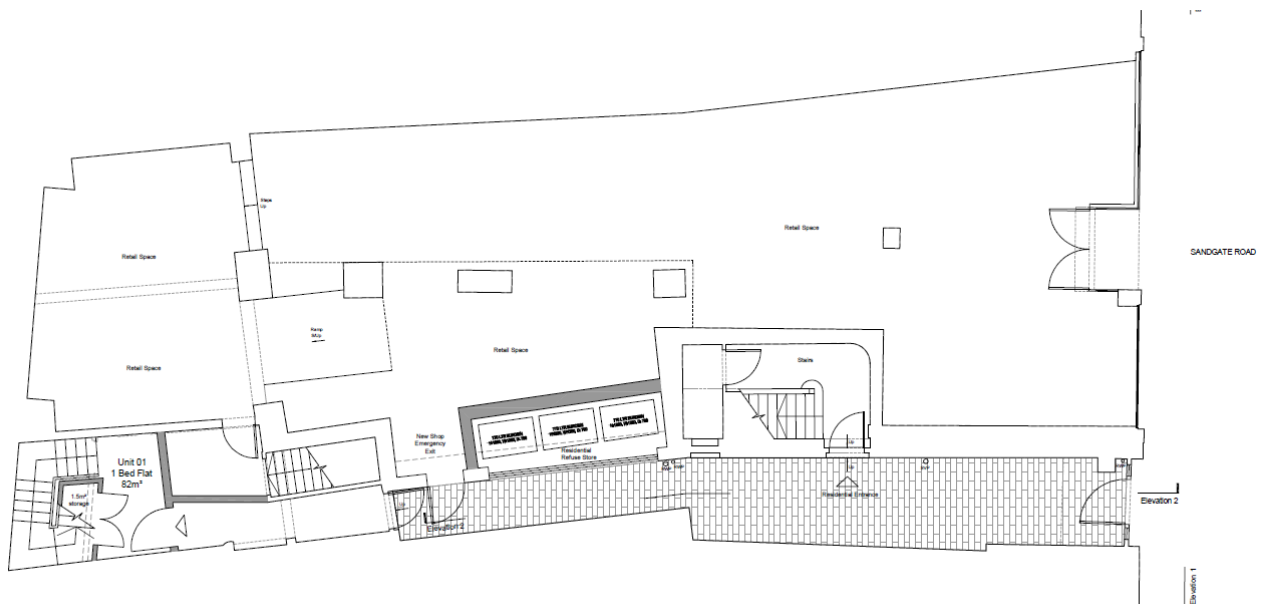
Ground Floor Plan proposed – showing bin storage and access to unit 01
